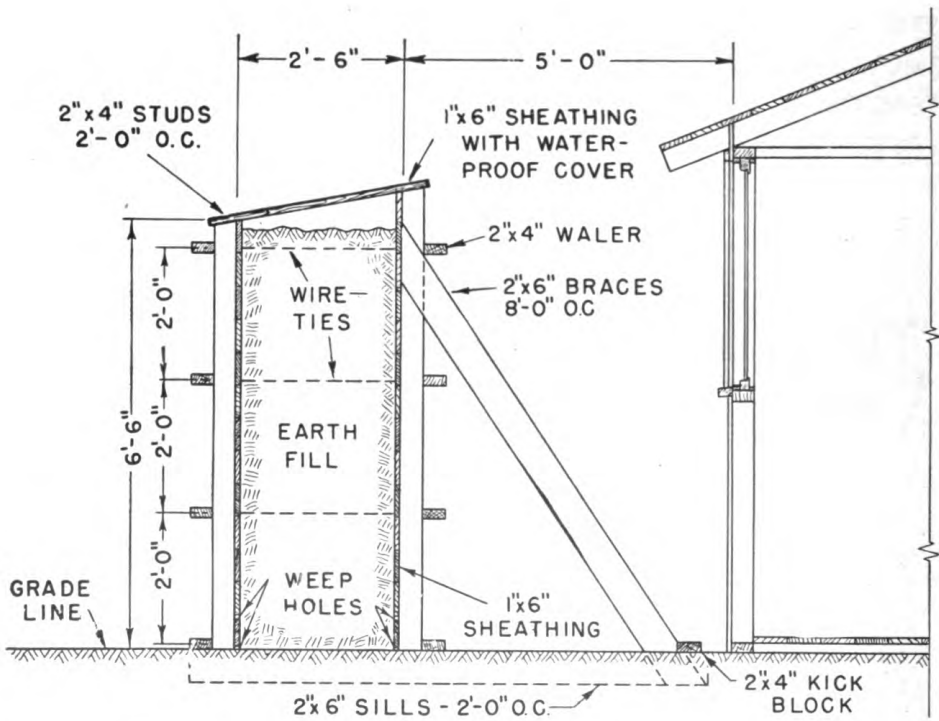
Protective wall for use around buildings. (See fig. 150.)
